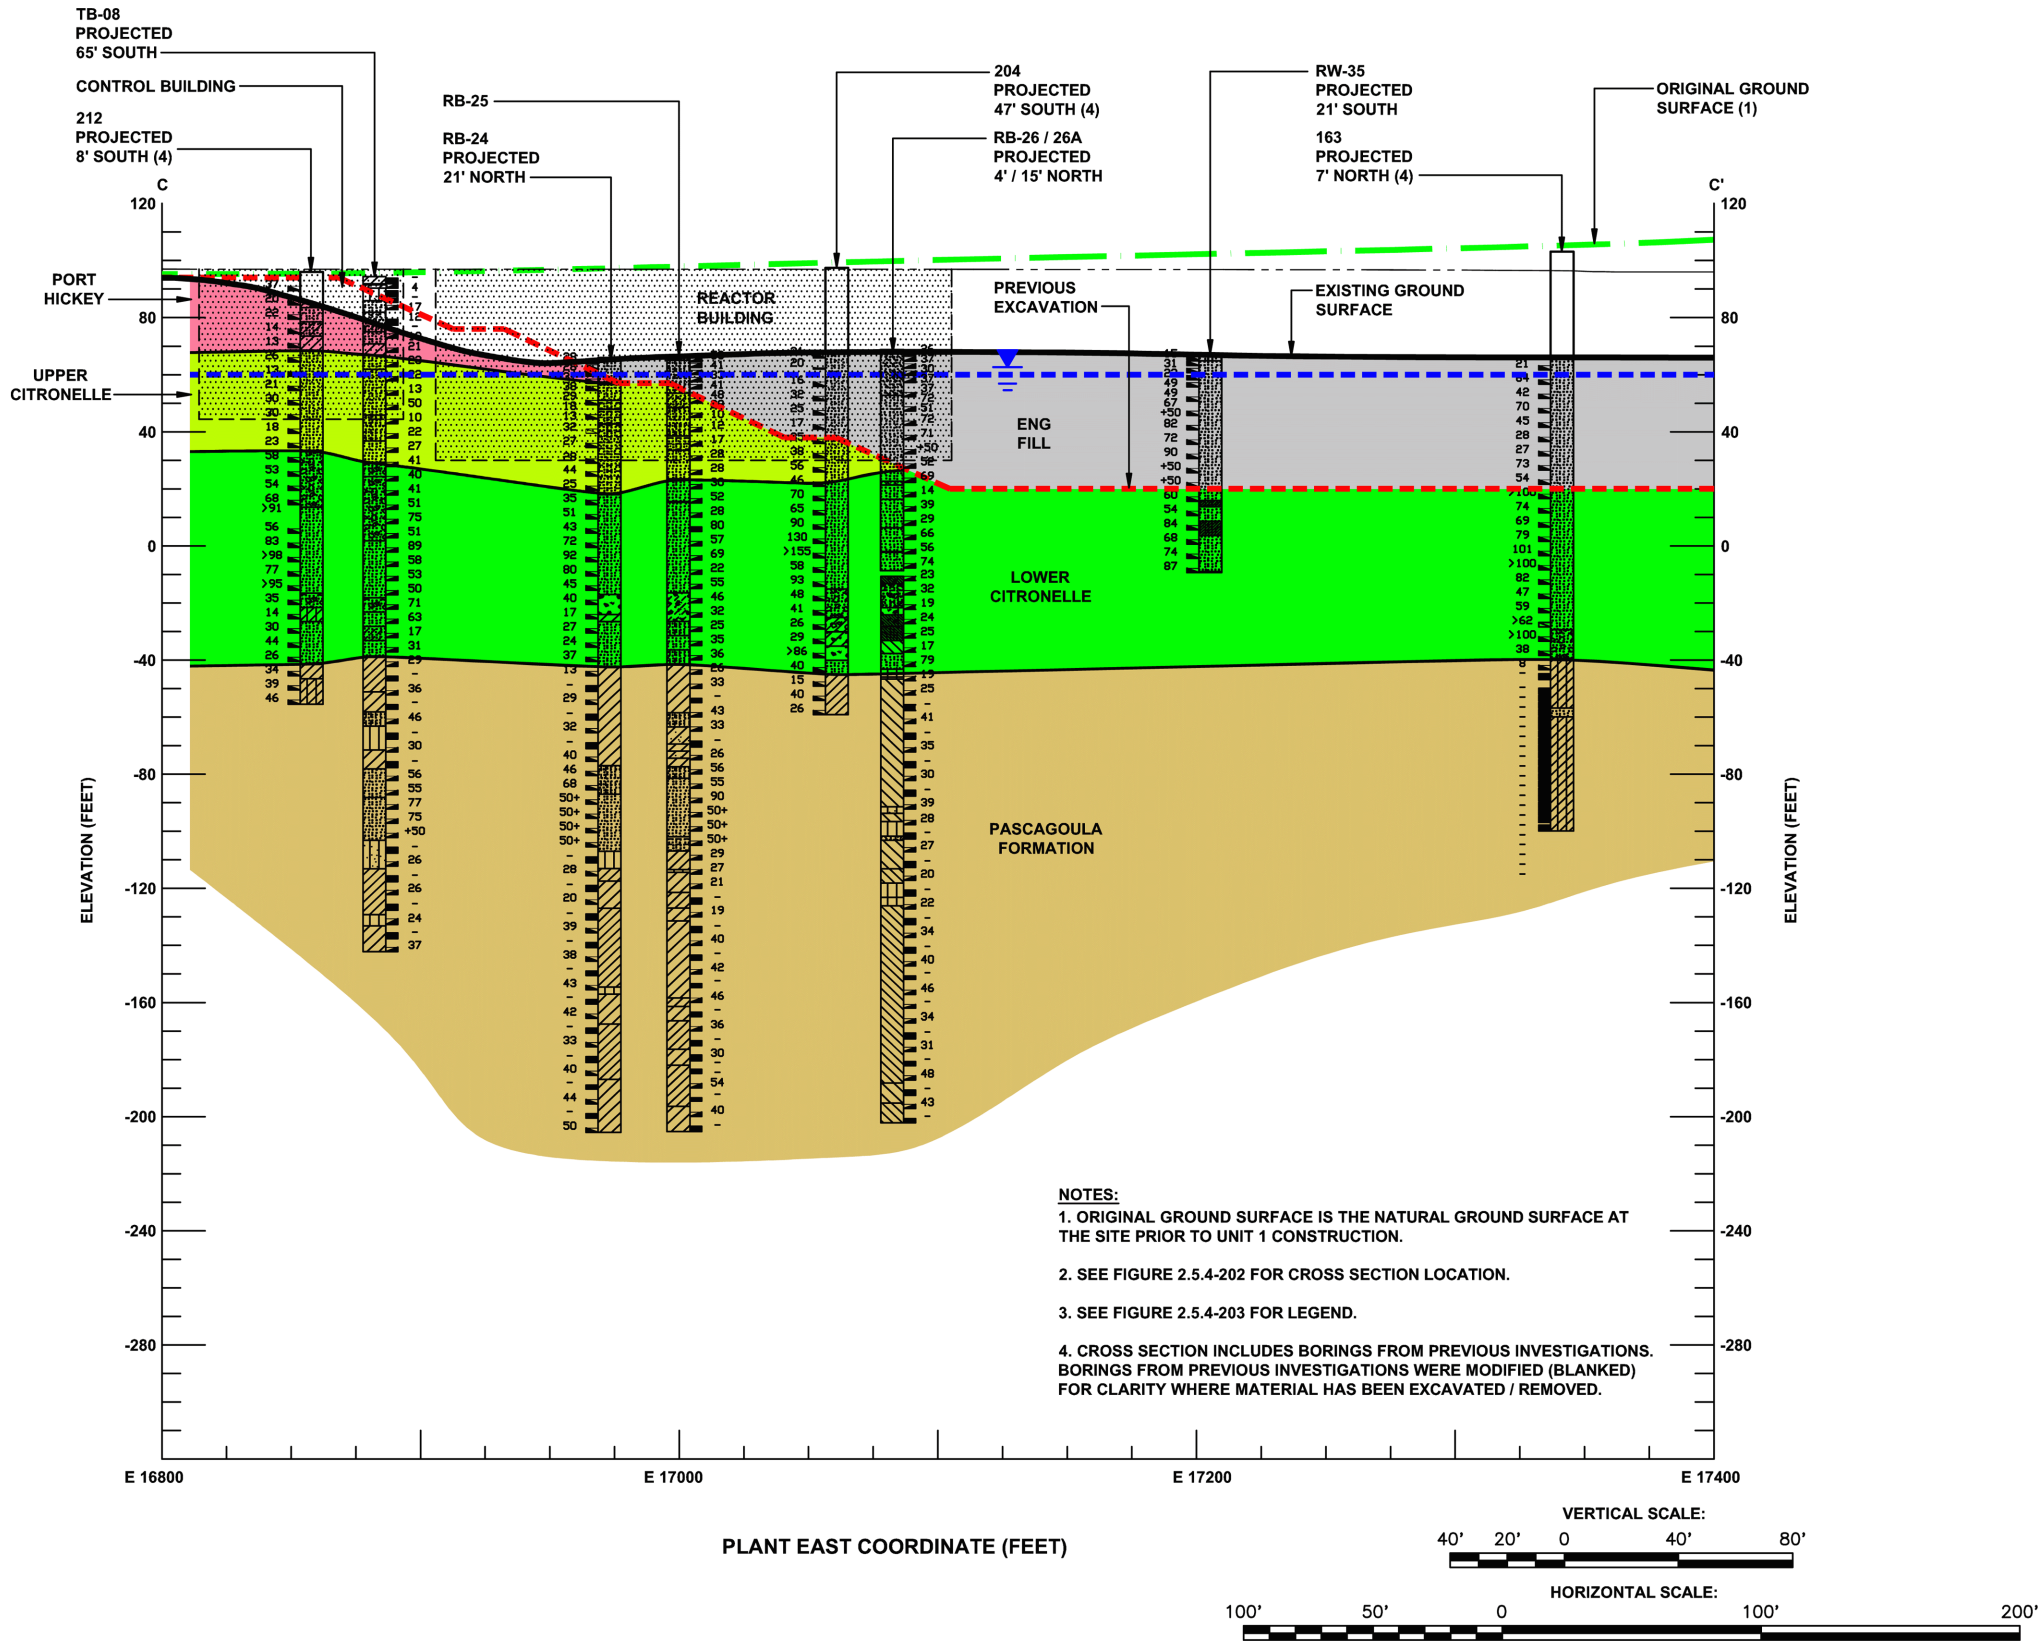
Cross Section C-C' Through RBS Unit 3 Site Location
